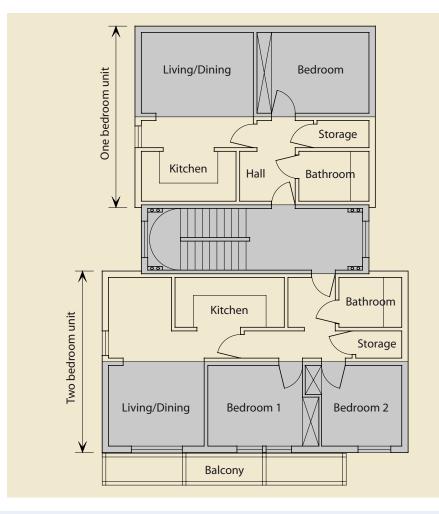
Plan form of modular residential building – alternate modules shown shaded
